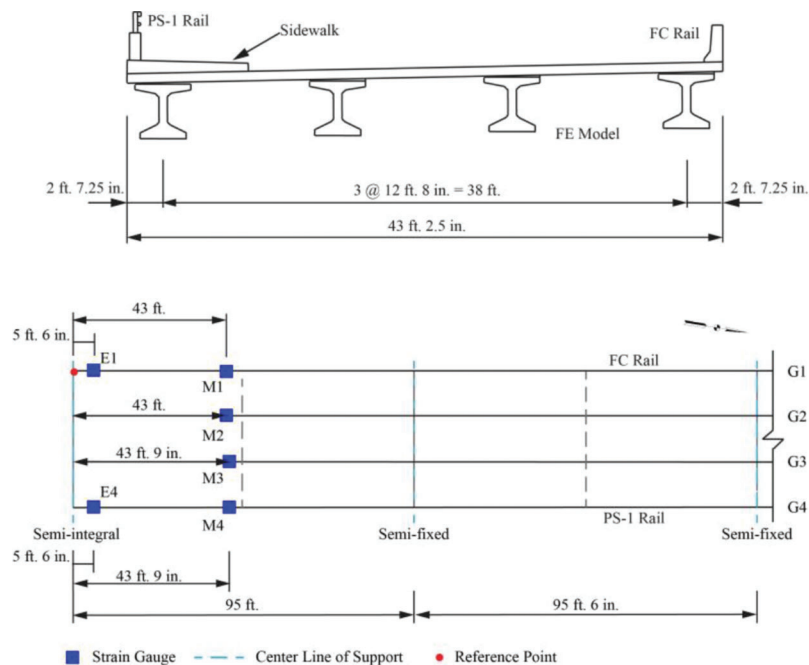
Cross-section, frame plan, and strain gauge locations for Asset 331-71-08732.
